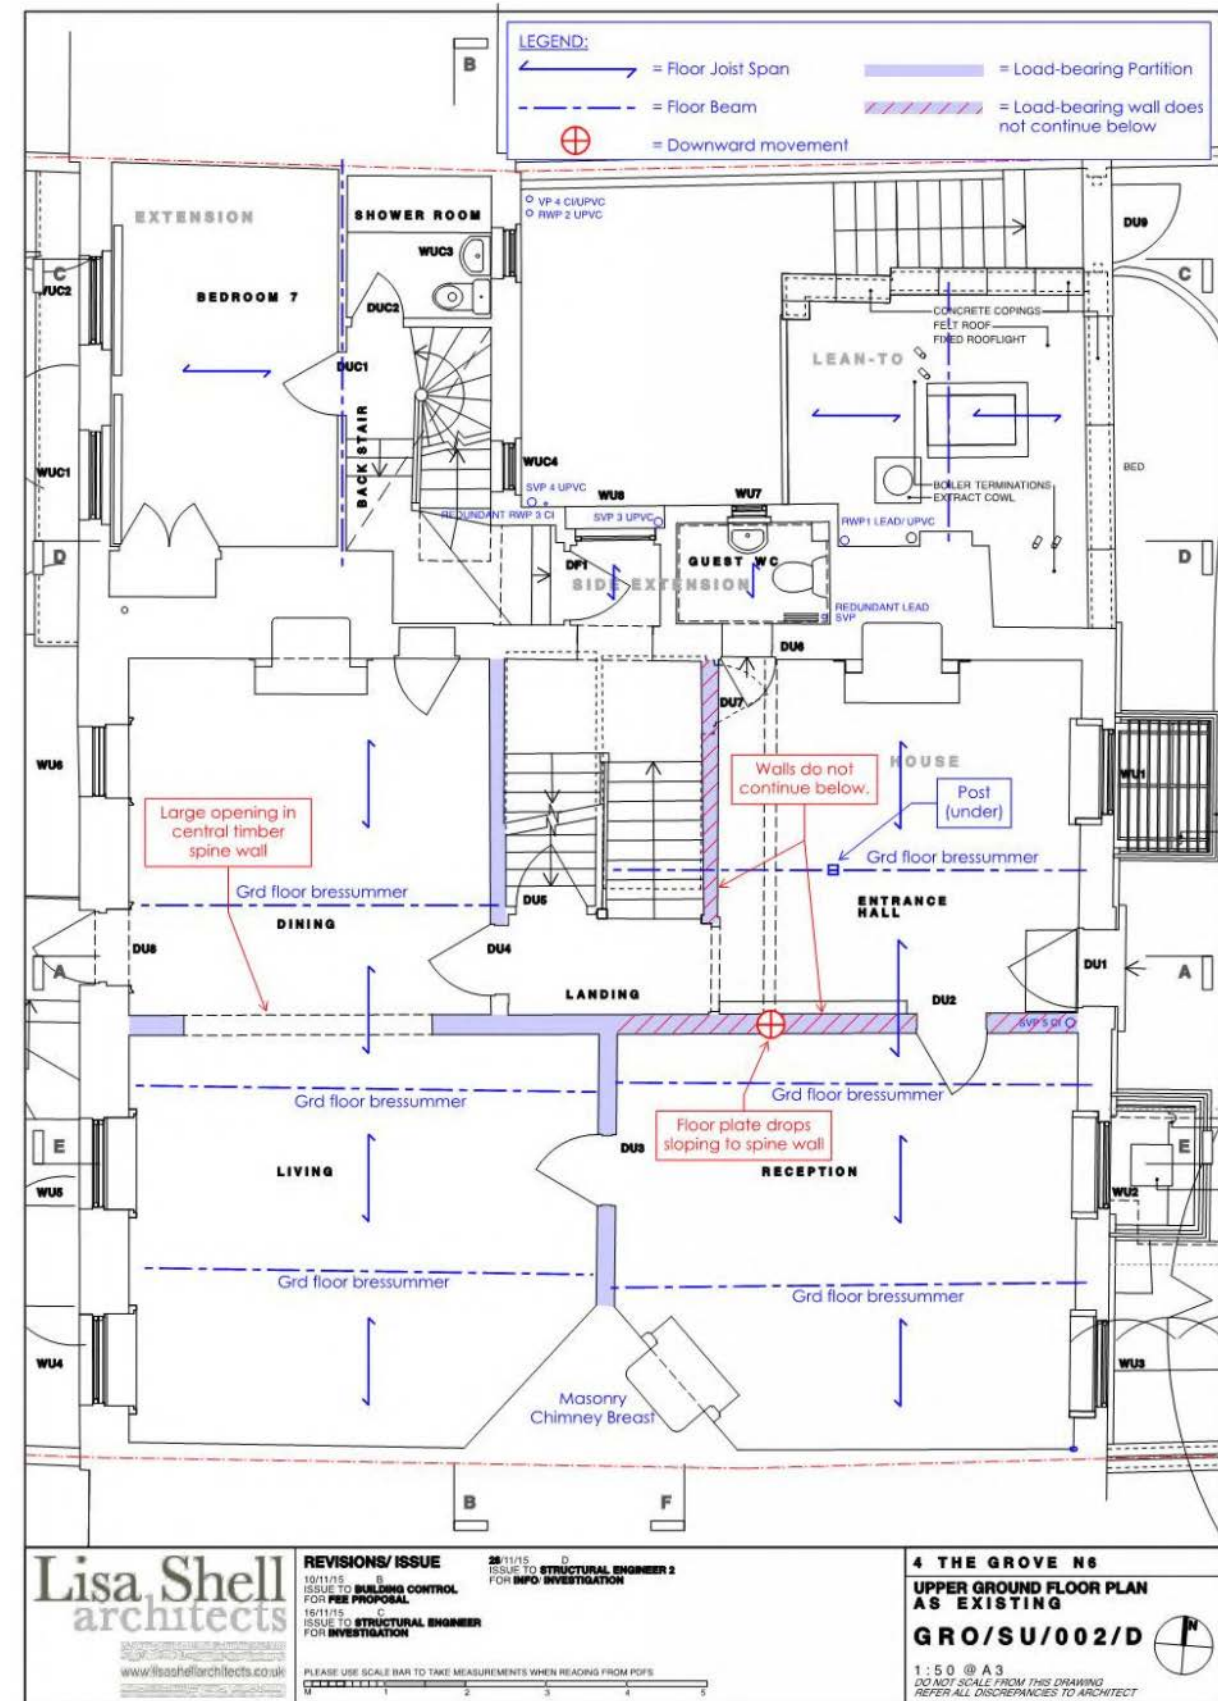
Mark-up of Existing Upper Ground Floor Level
